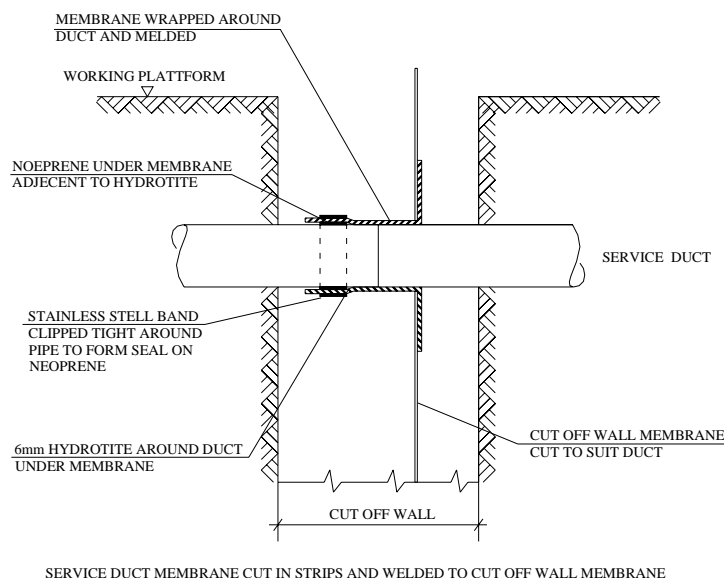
Construction of the geomembrane cut-off wall around a service crossing (from Barker et al., 1997)
